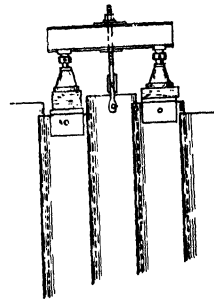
Drawing Steel Piles with Screw Jacks.
